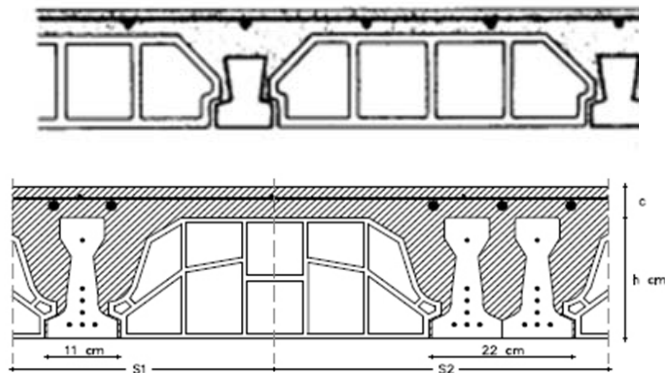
Top to bottom: one way slabs with semi-resistant joists and self-bearing joists
